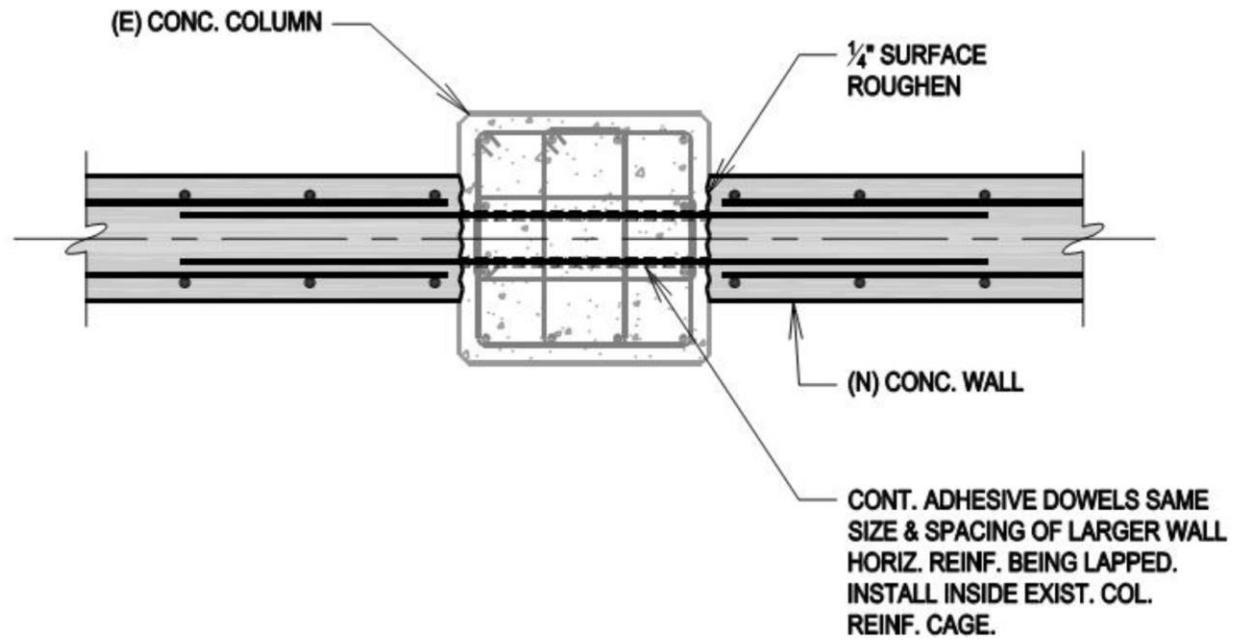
Example Detail of Shear Wall/Column Dowel Connection
